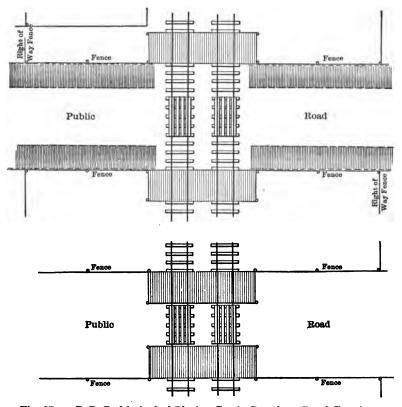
C. P. R. Method of Placing Cattle Guards at Road Crossings.
